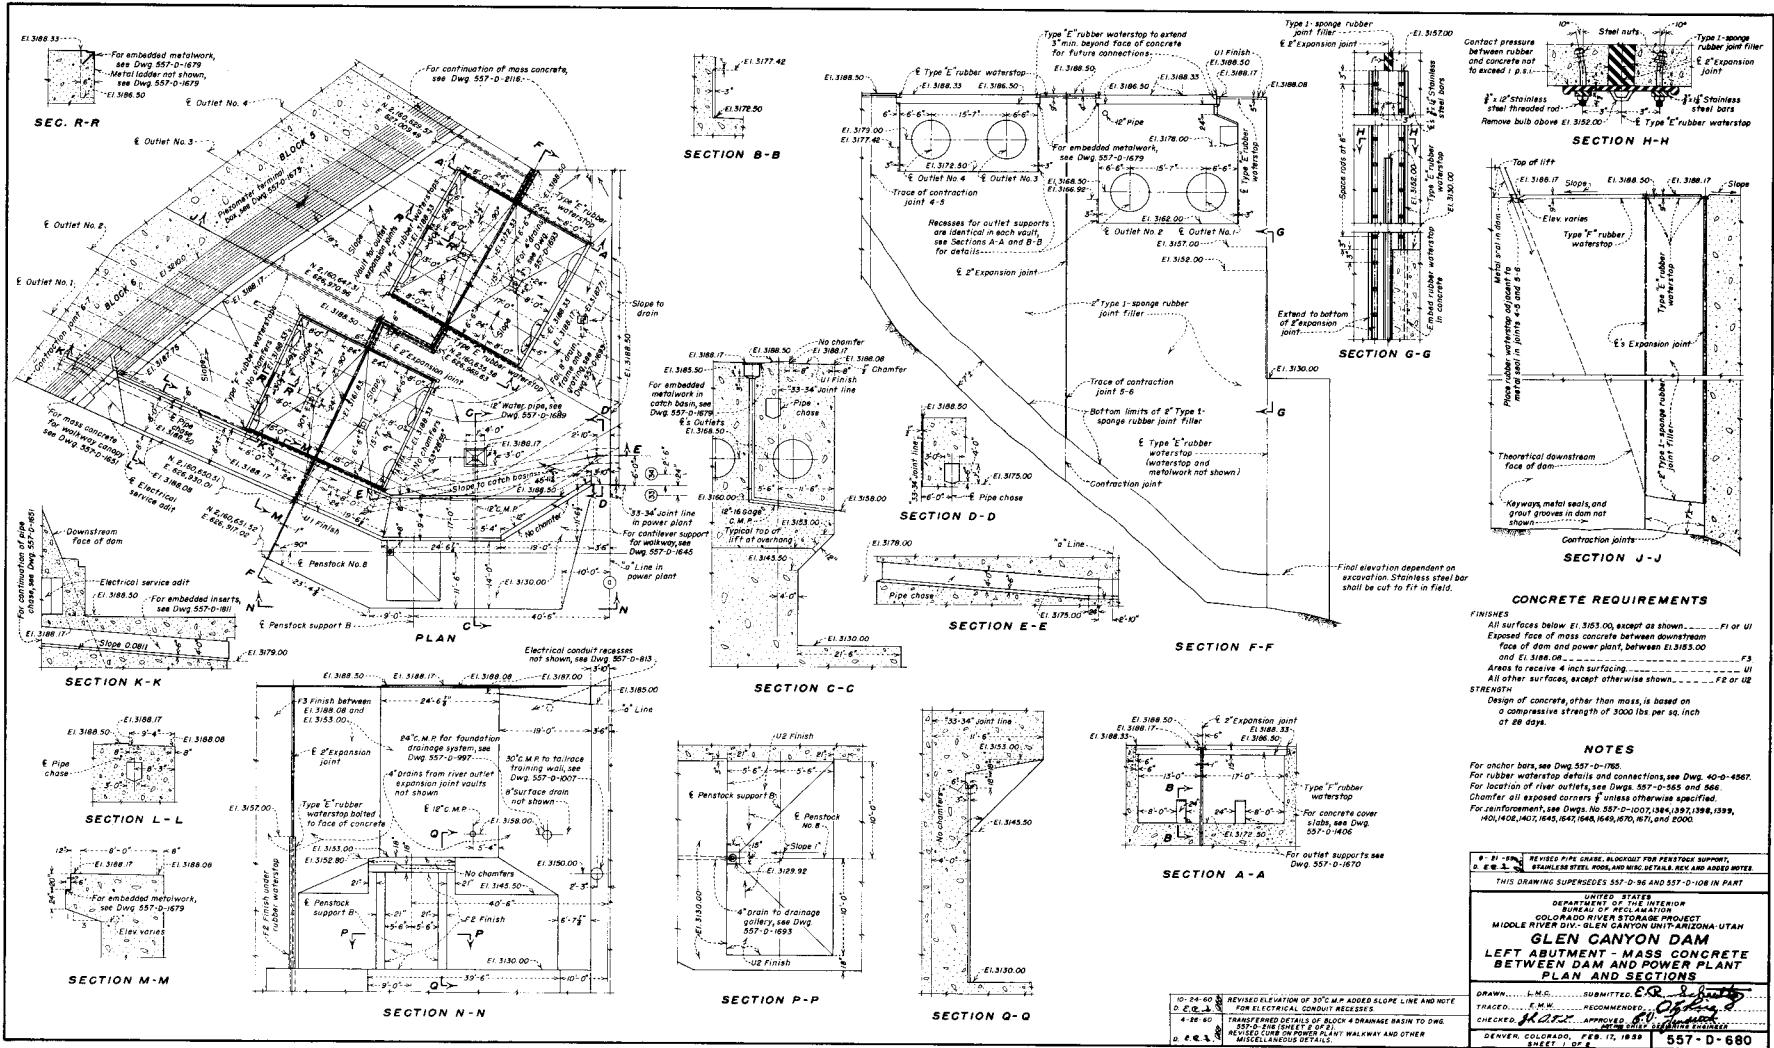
Left abutment, mass concrete between dam and powerplant—Plan and sections.
